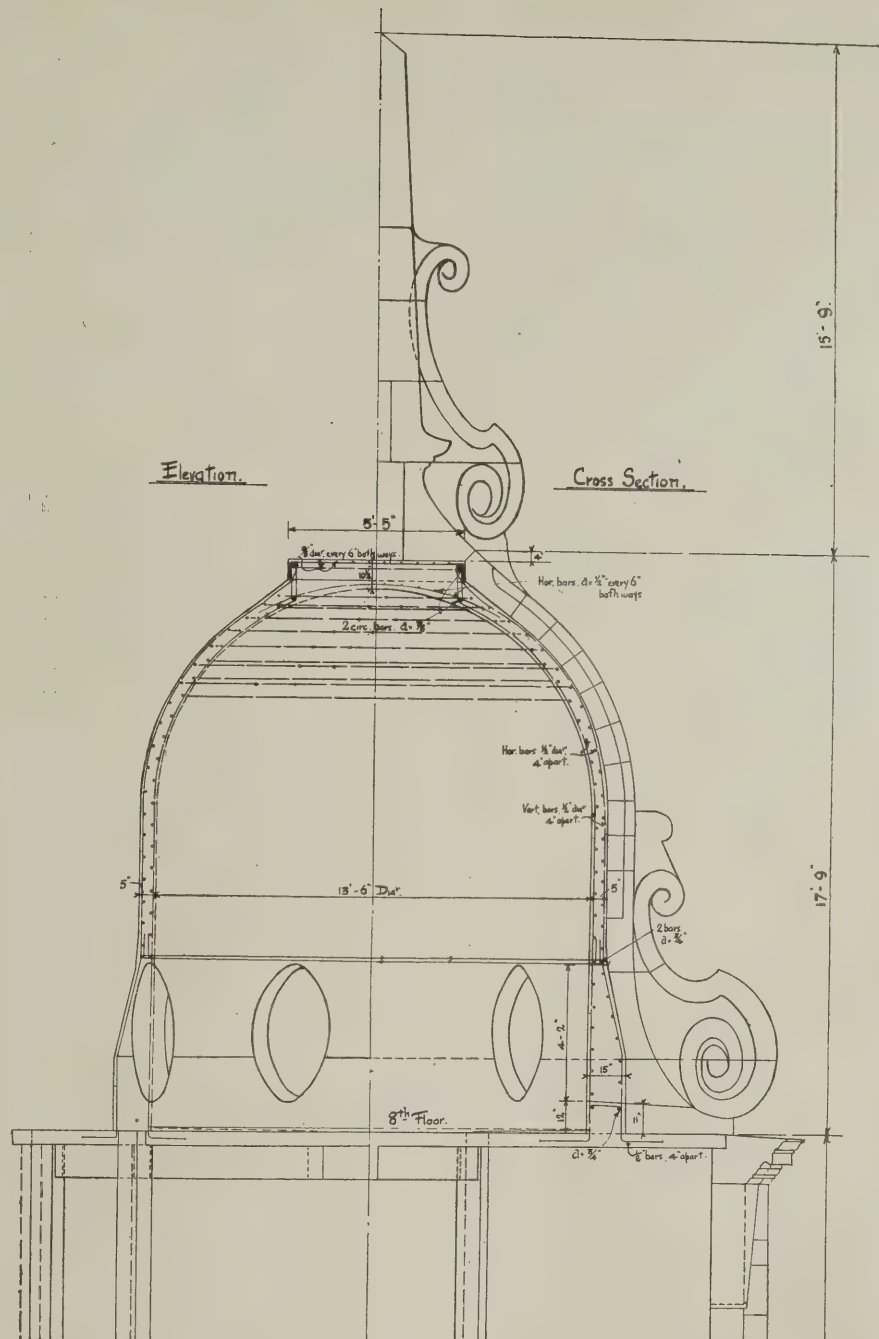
REINFORCED CONCRETE DOME. NEW CENTRAL Y.M.C.A. BUILDING, TOTTENHAM COURT ROAD, LONDON.
